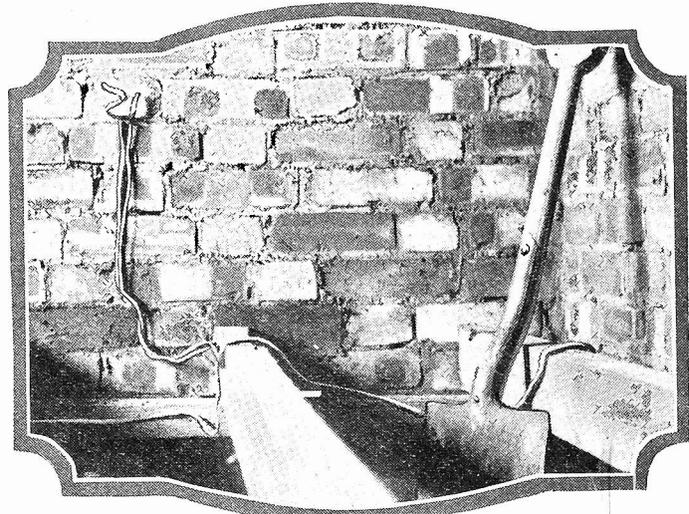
Right and wrong ways of leading wires over flooring joists. A loop must be left before the wire climbs the wall
